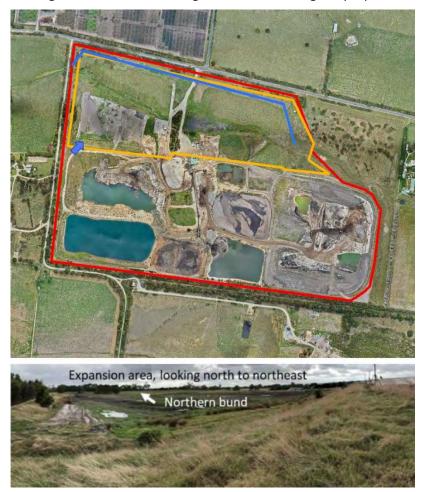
(Upper) Indicative arrangement of the proposed expansion area (orange). (Lower) Site photograph taken from the southwest (viewed northeast across the area of the upper photograph)
